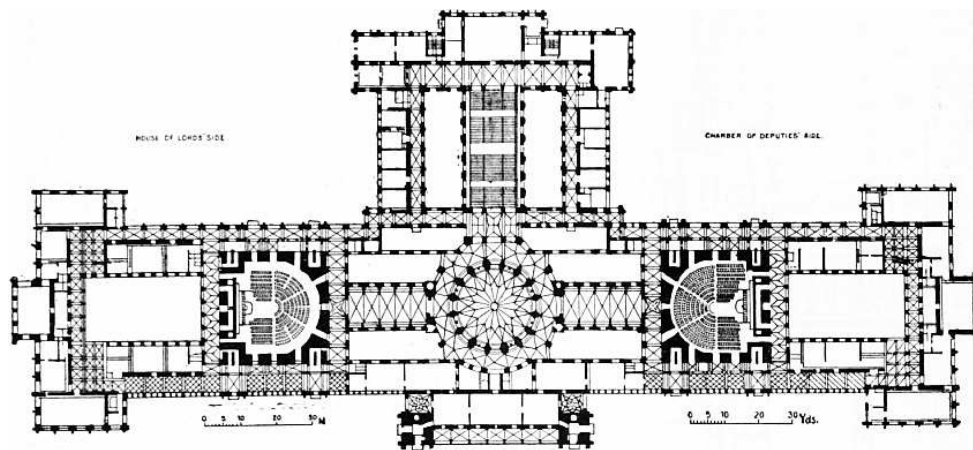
Plan of the Parliament House, Budapest. (Steindl.)
